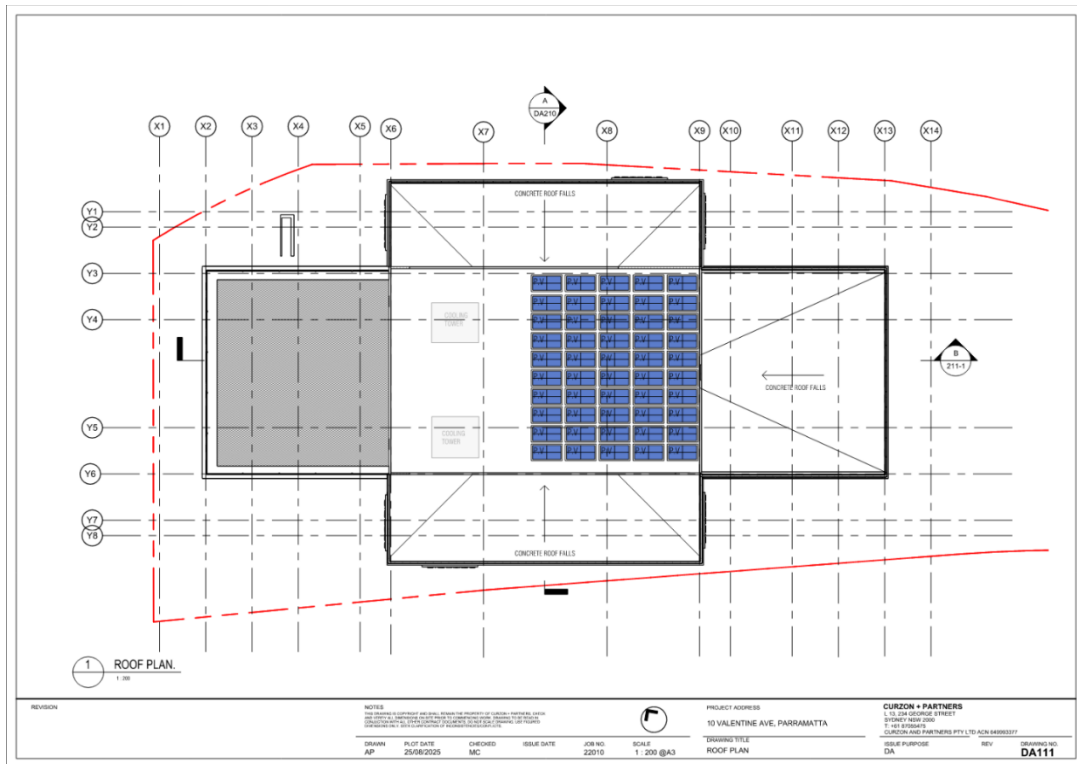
Roof plan, DA111 (Source: Curzon + Partners)
